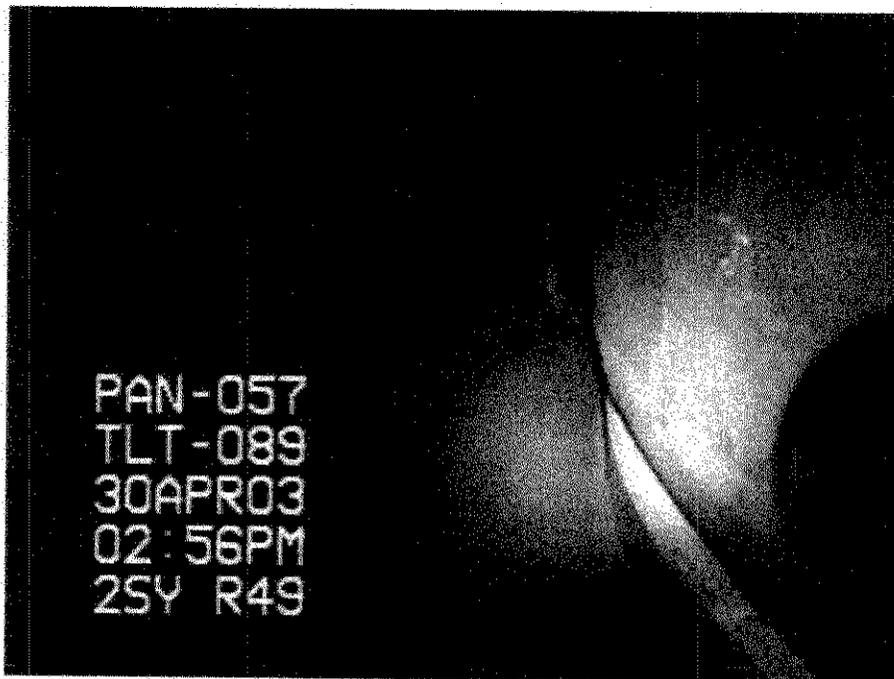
SY-102 Riser 49, Primary Tank, Annulus Floor/Instrumentation/Concrete Insulating Ring (Left, 2003)
